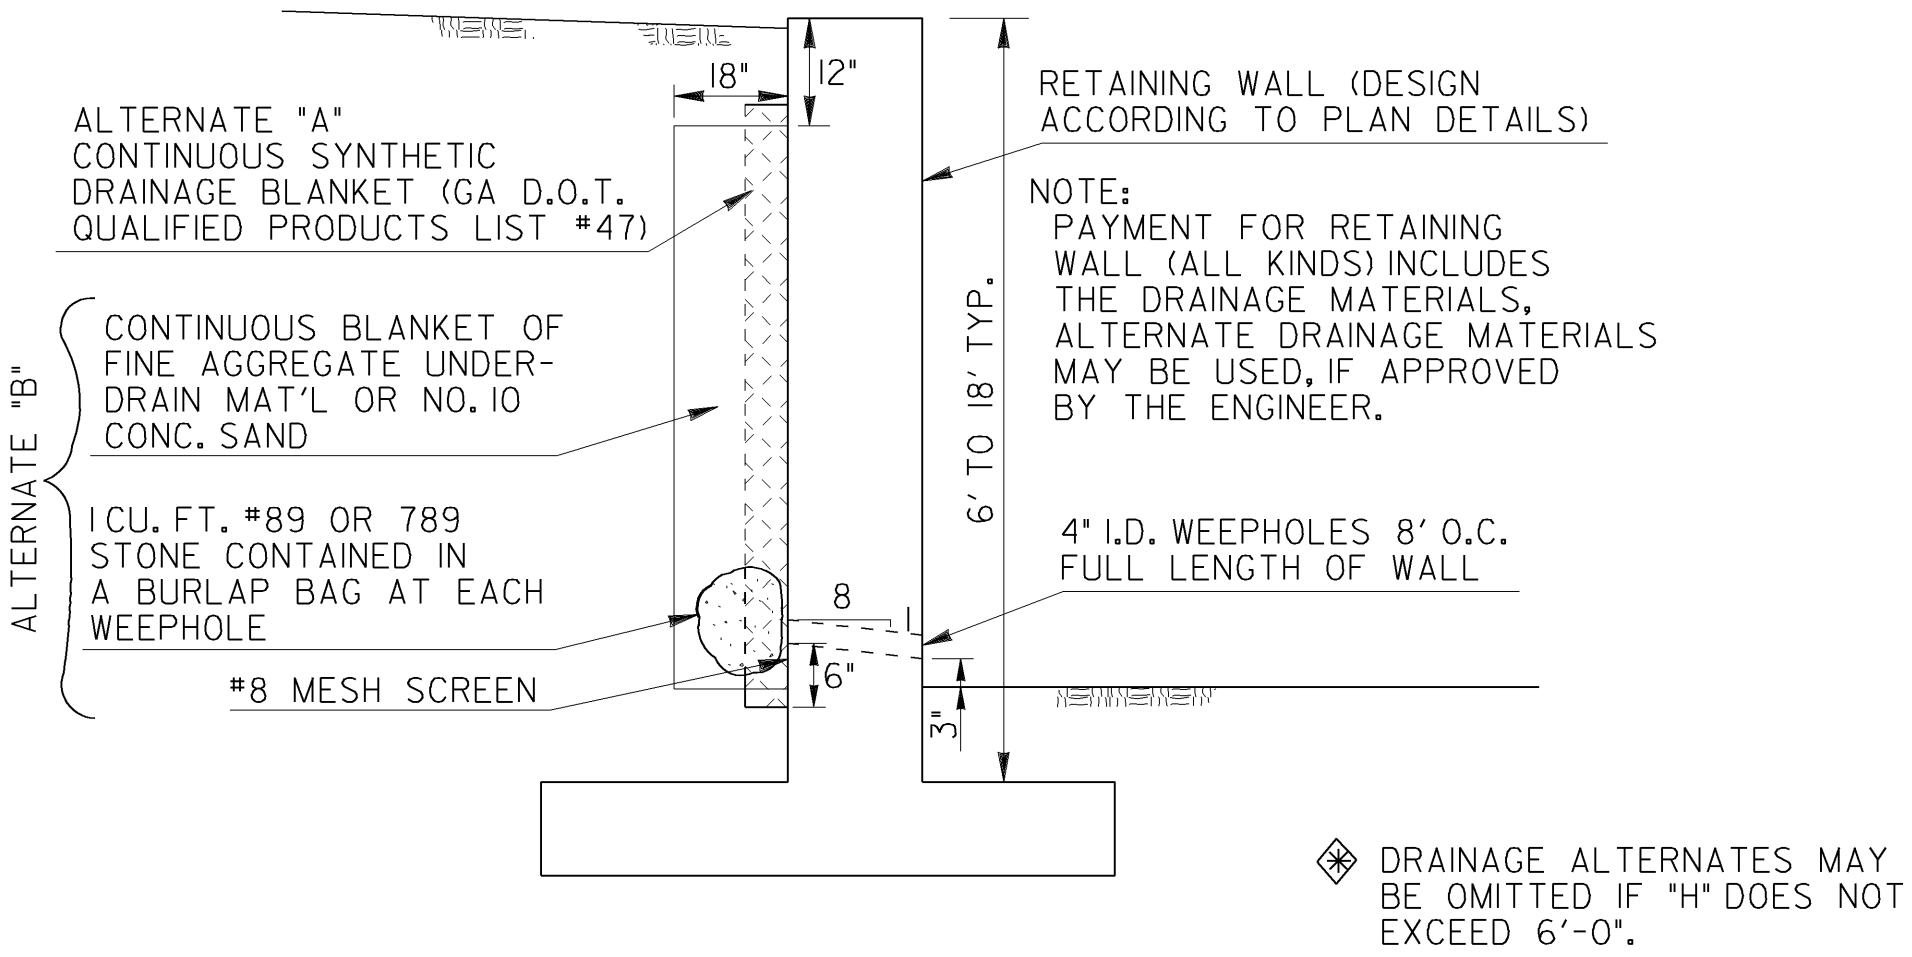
DETAILS OF RETAINING WALL TYPICAL SECTIONS
